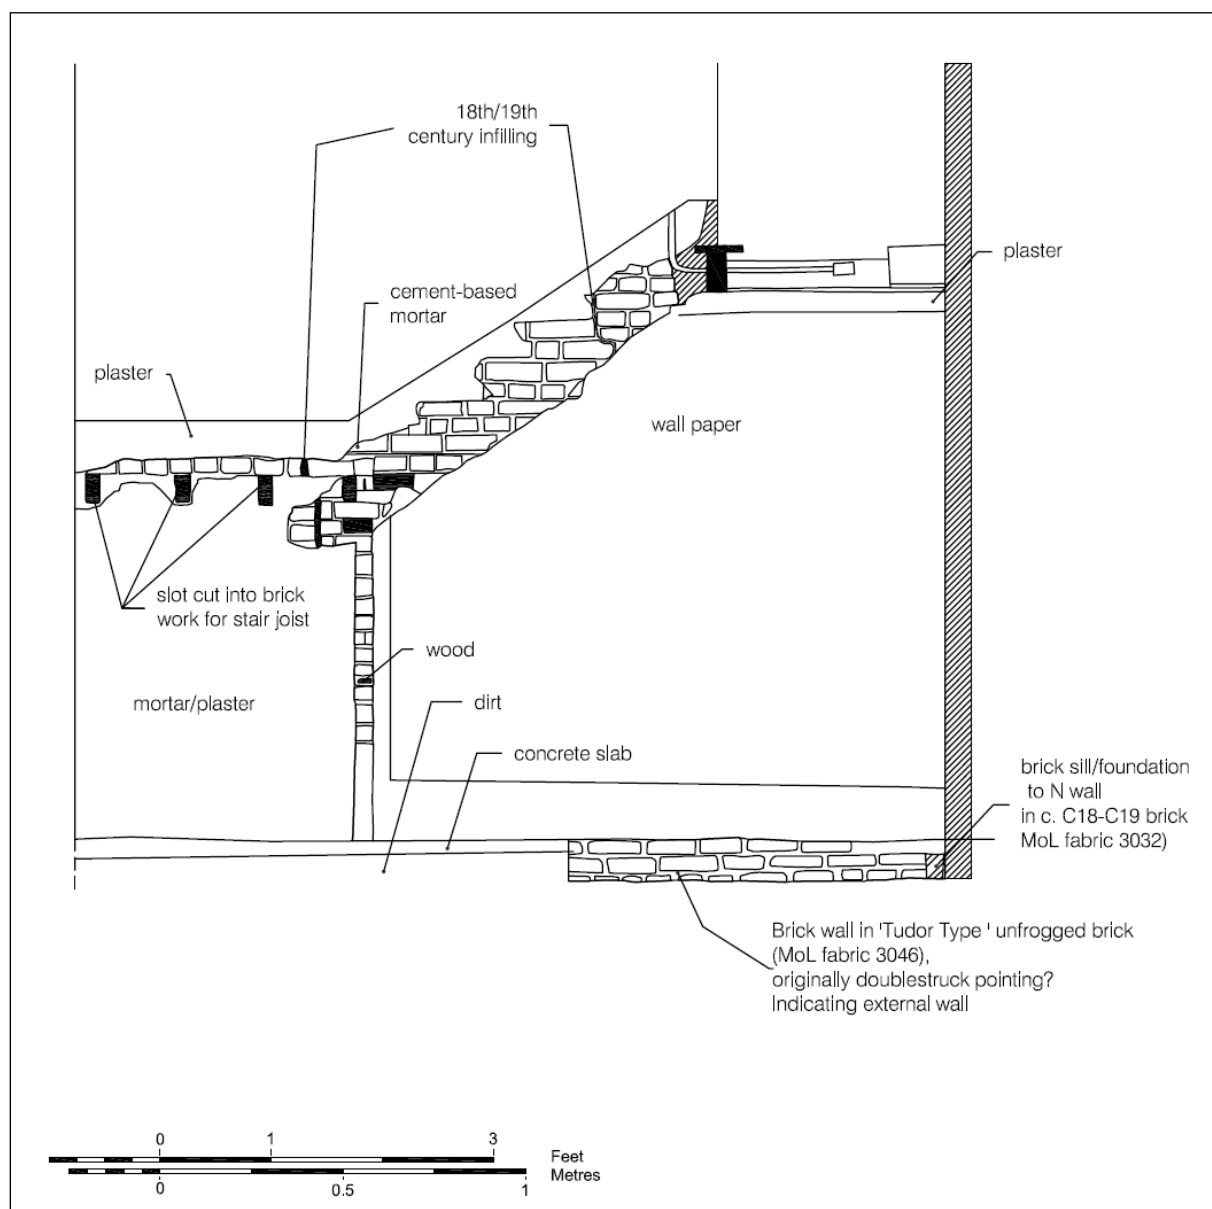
Room 35, east-facing, internal west elevation (Dwg. BRE6)
